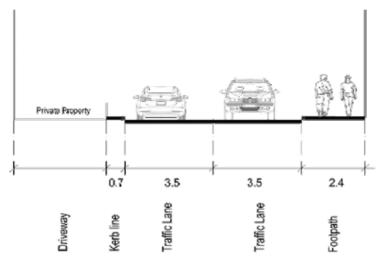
Pritchard Street Section at Mall Site - Looking West
